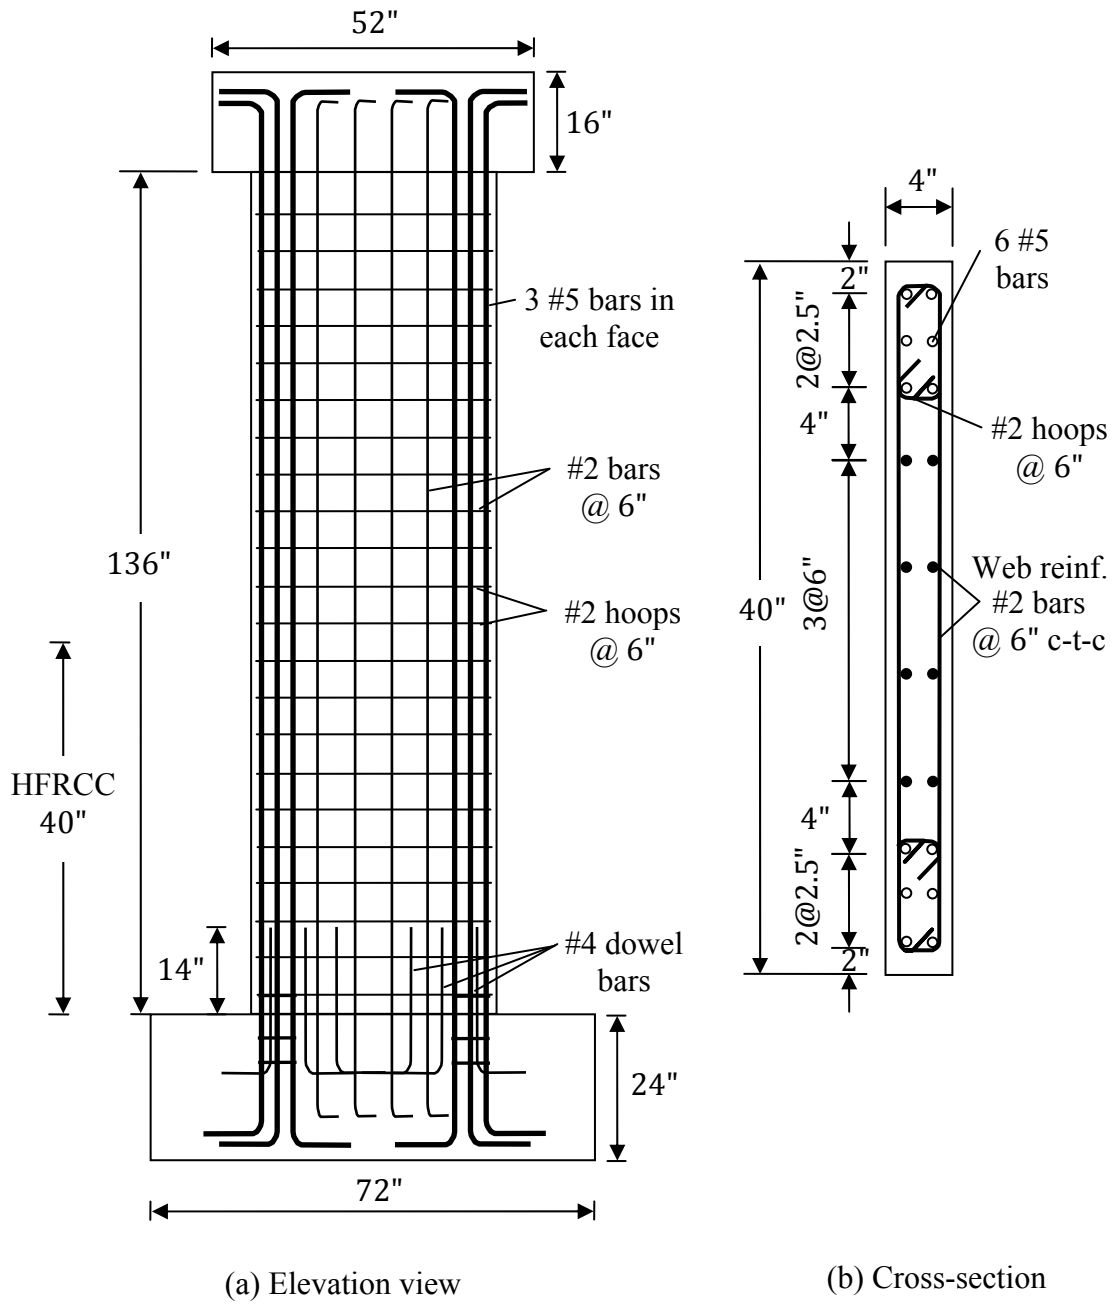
Reinforcement details of slender wall specimen (Para-Montesinos et al, 2006)
